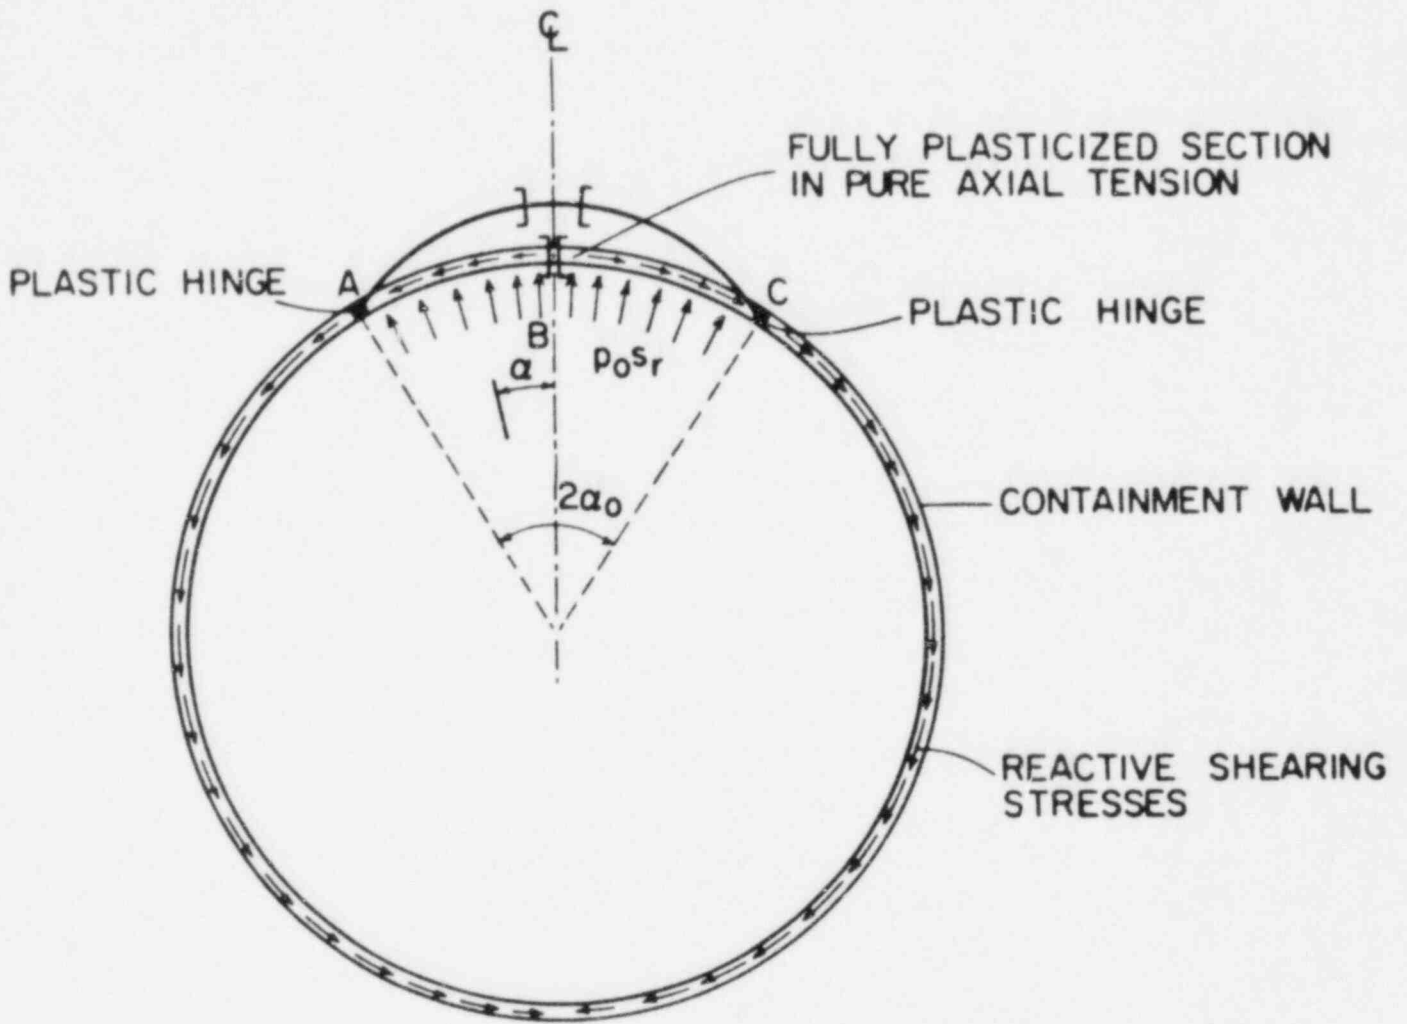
Collapse Mechanism for Ring Section with Effective Shell Width
